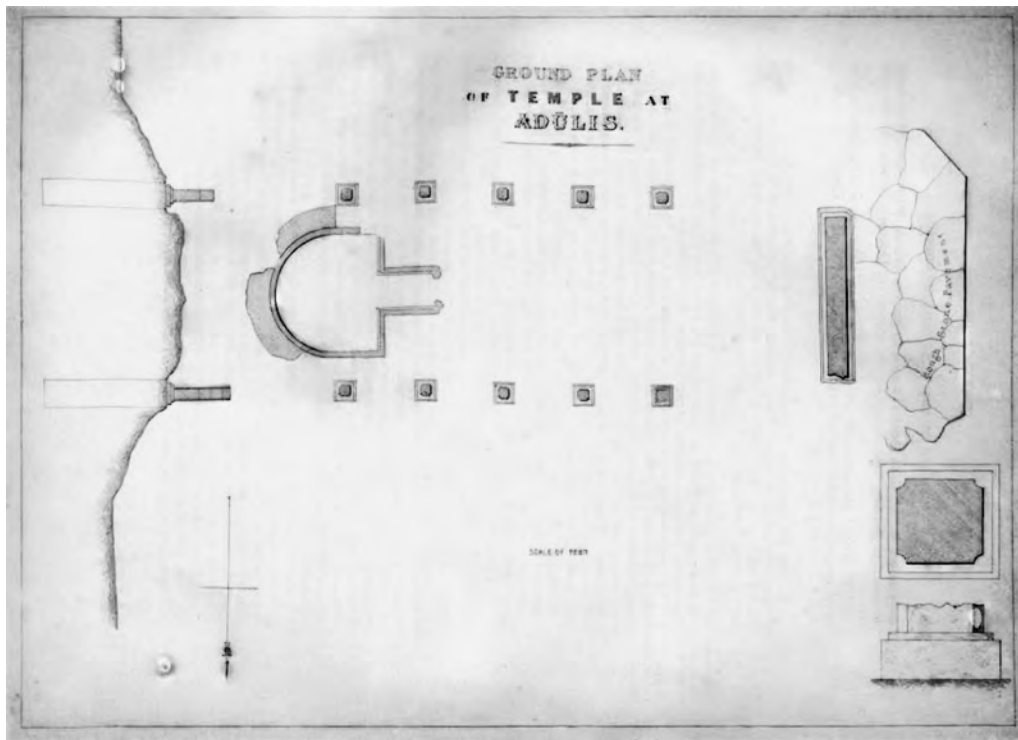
Plan and elevation of the church, and drawings of the finds entered in the British Museum from Captain Goodfellow's report (Holland, Hozier 1870).
